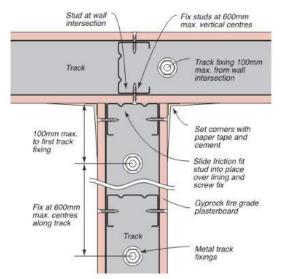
Intersecting Detail Corner Detail CSR Red Book
